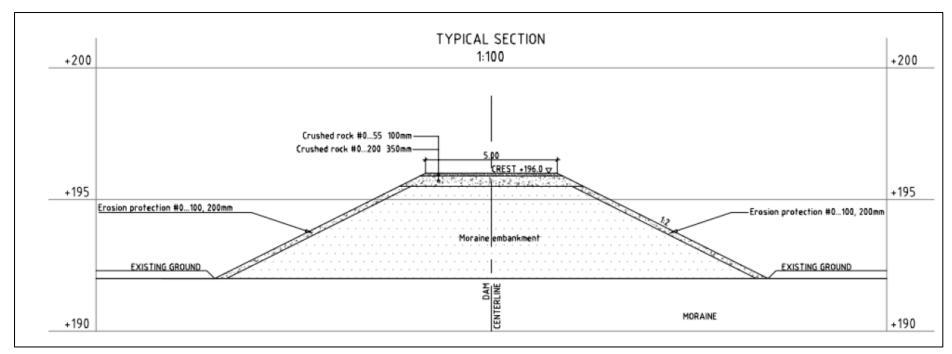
Typical section of the TMF Flood Cutoff Dam
